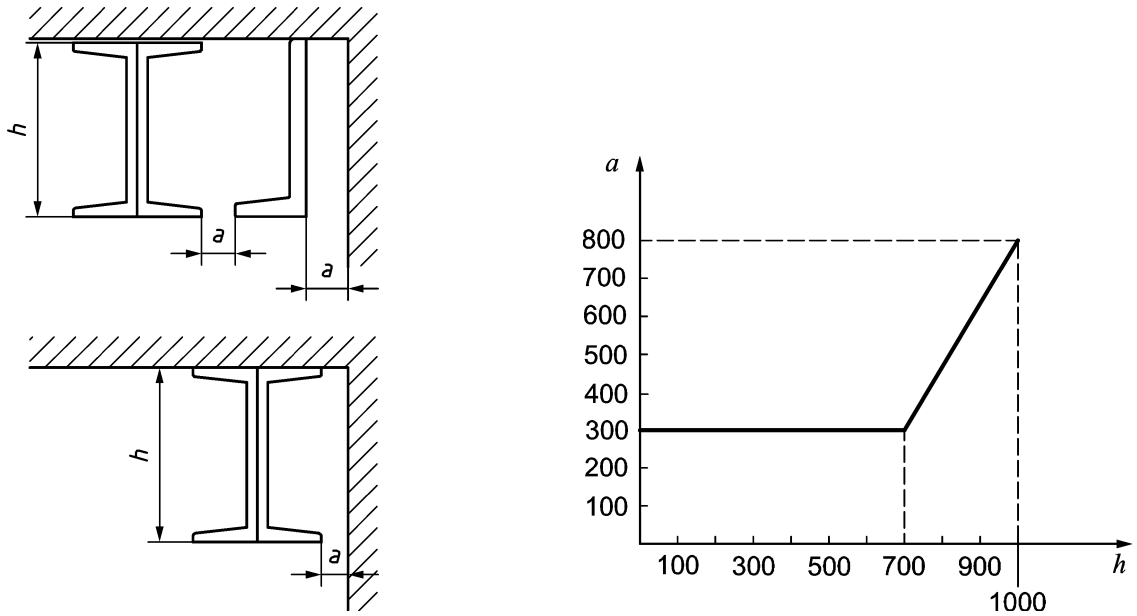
Minimum dimensions for narrow spaces between surfaces
